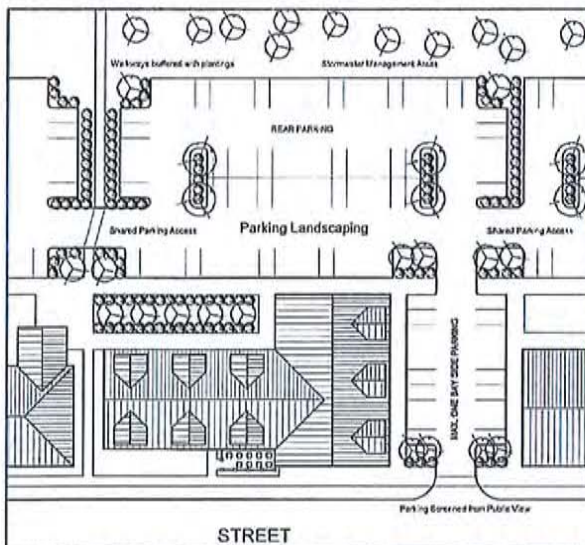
Parking should be located on the side or behind buildings in the Main Street Sub-Area. A maximum of one bay perpendicular to the street is permitted in this area.
